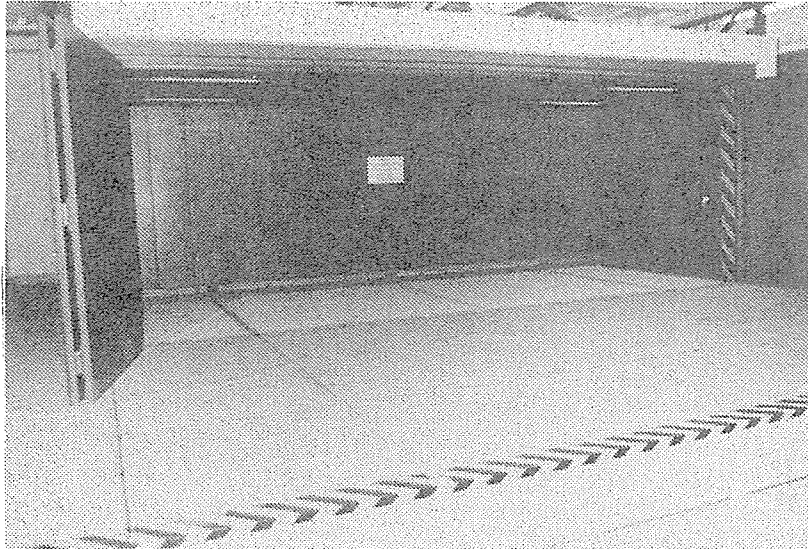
Car of the Dresden Semper Opera House lift which can be loaded on the long and narrow side
